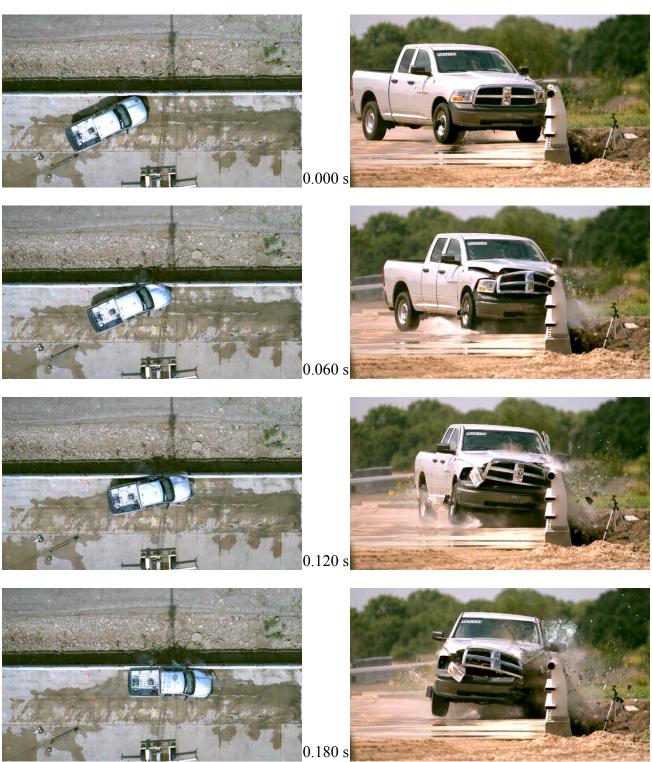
Sequential Photographs for Test No. 490026-4-2 (Overhead and Frontal Views).
